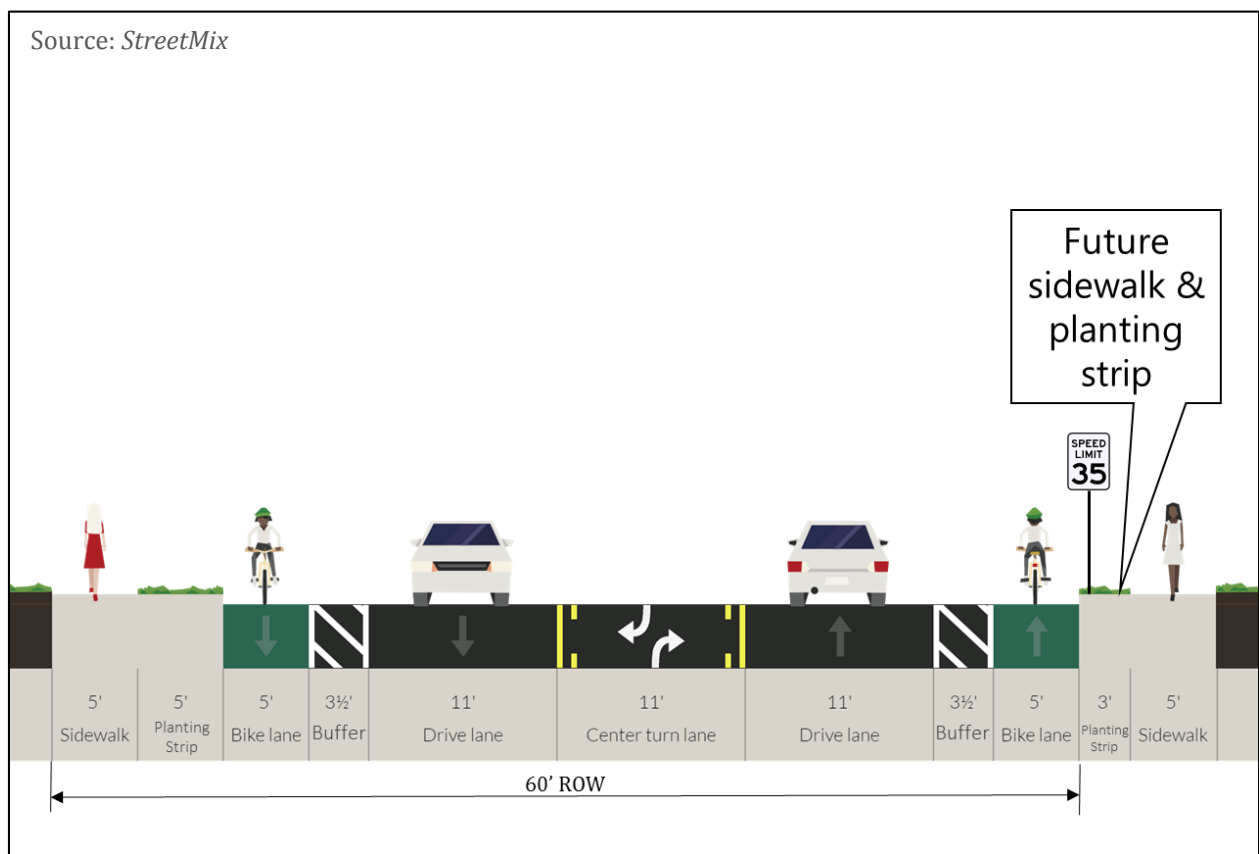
SR 28 Roadway Typical Section - 60' ROW
